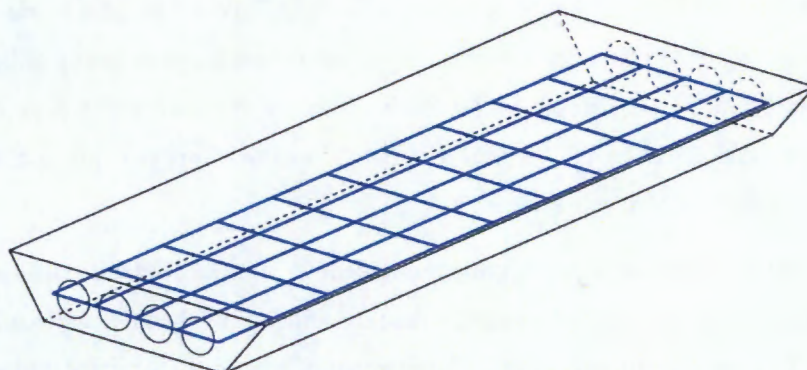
Typical grillage model of a voided slab bridge deck (Diaz *et al.*, 2010).
